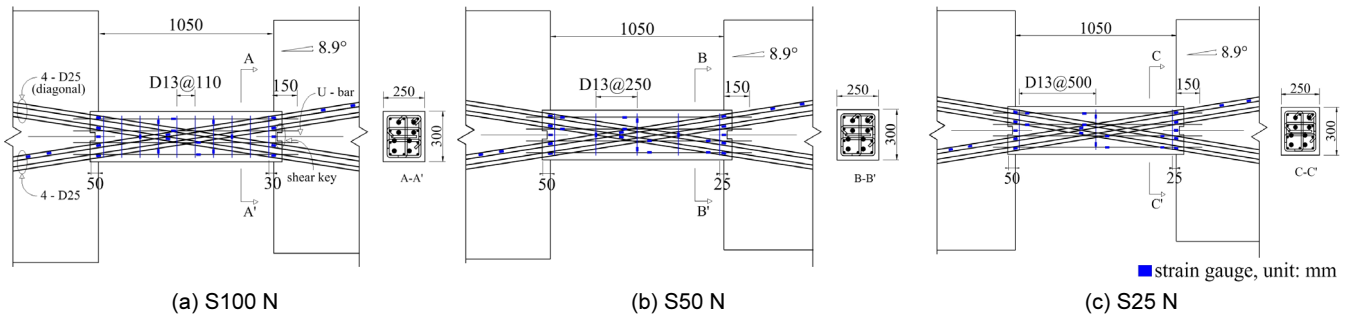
Reinforcement details and strain gauge layout for three specimens
